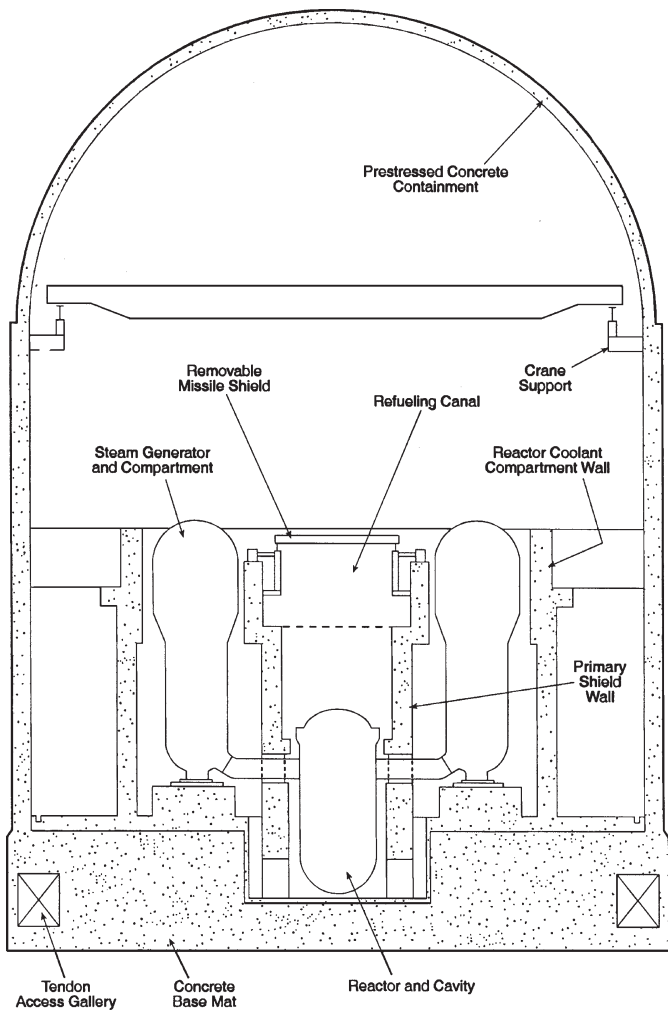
LARGE PWR PRESTRESSED REINFORCED-CONCRETE CONTAINMENT
